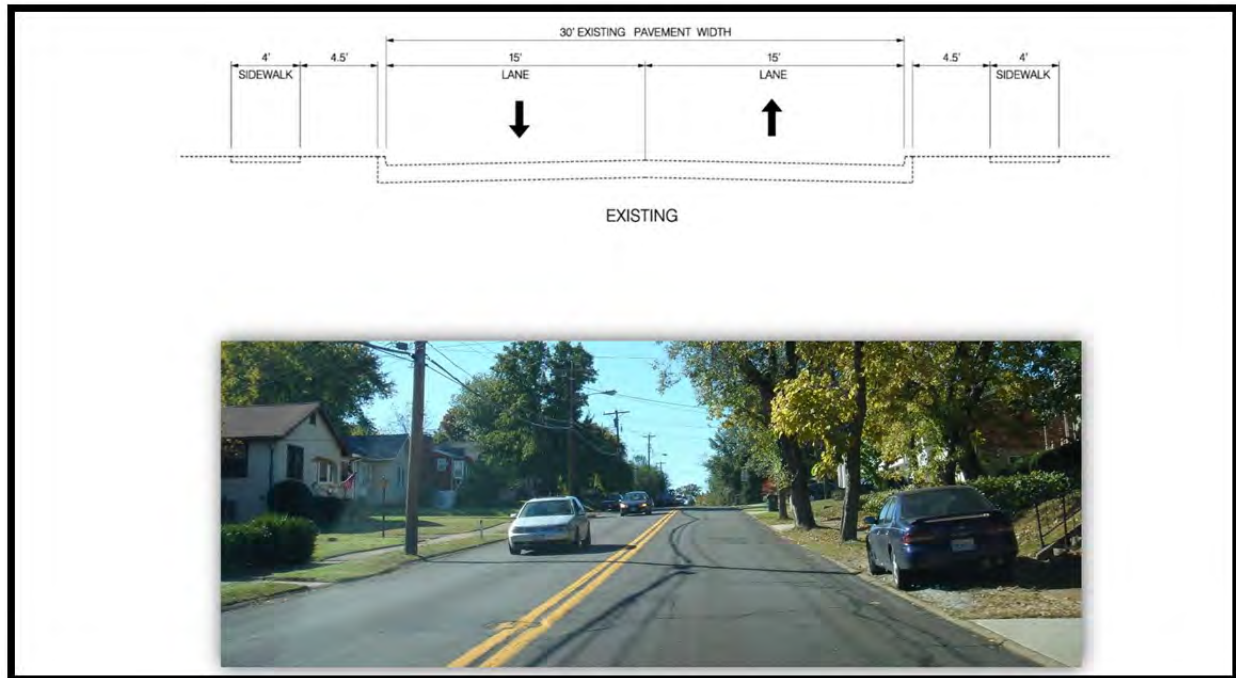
Lansdowne Avenue - Existing Cross-Section
